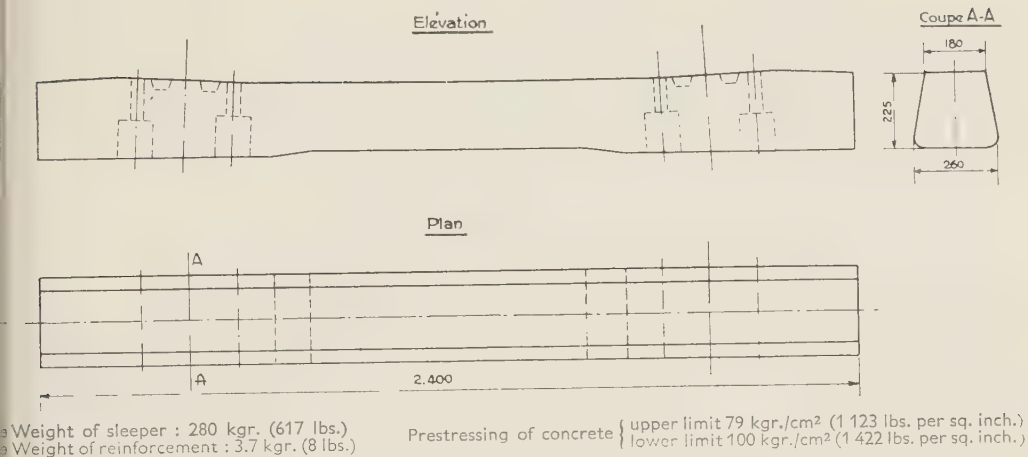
Italian Railways.* SCAC prestressed concrete sleeper.
